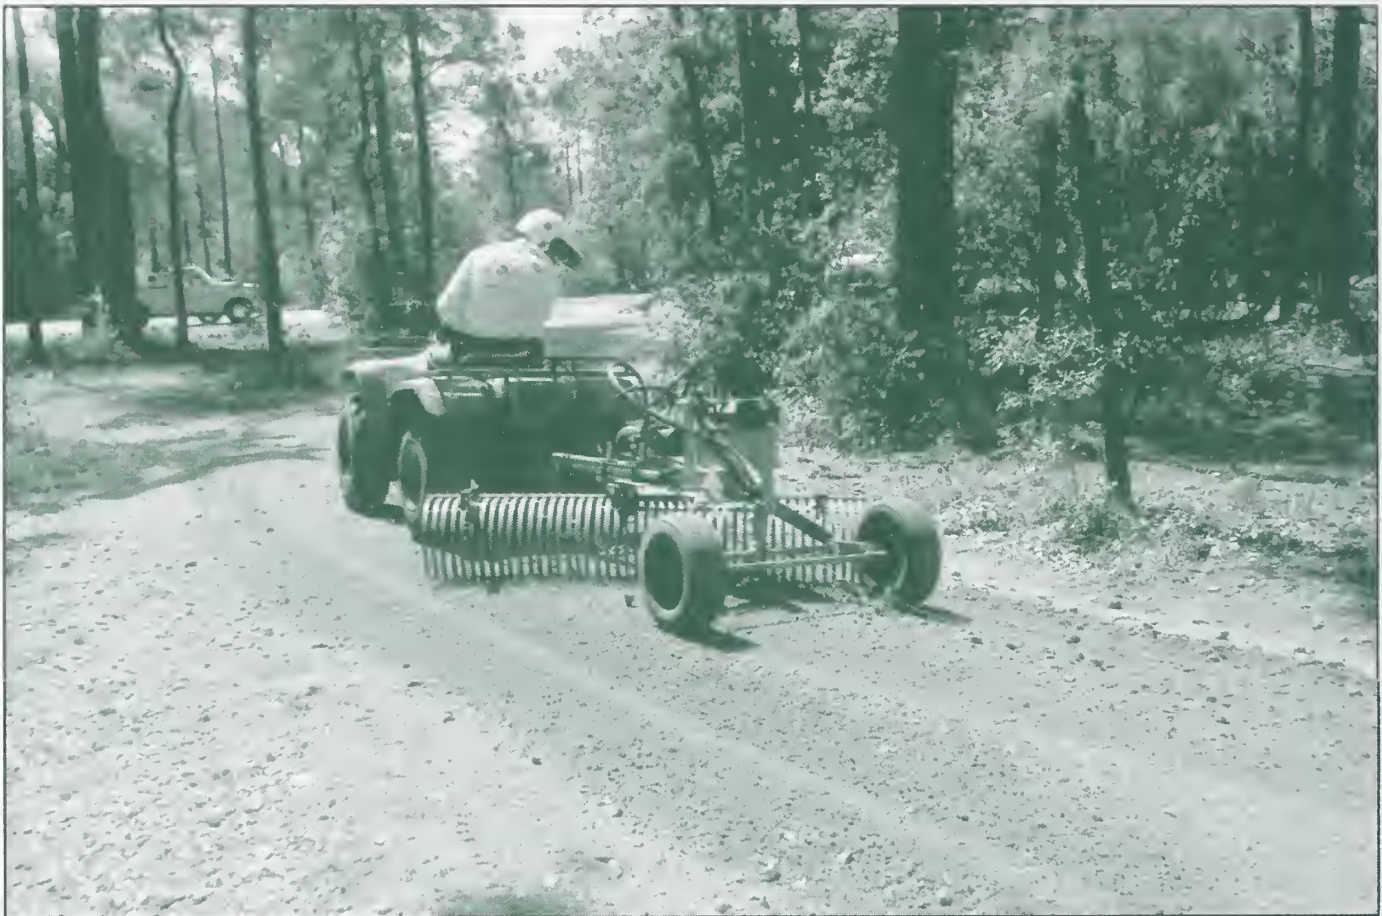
The trail rake and Ultra Light Terrain Grader worked great on campground roads and parking lots.
